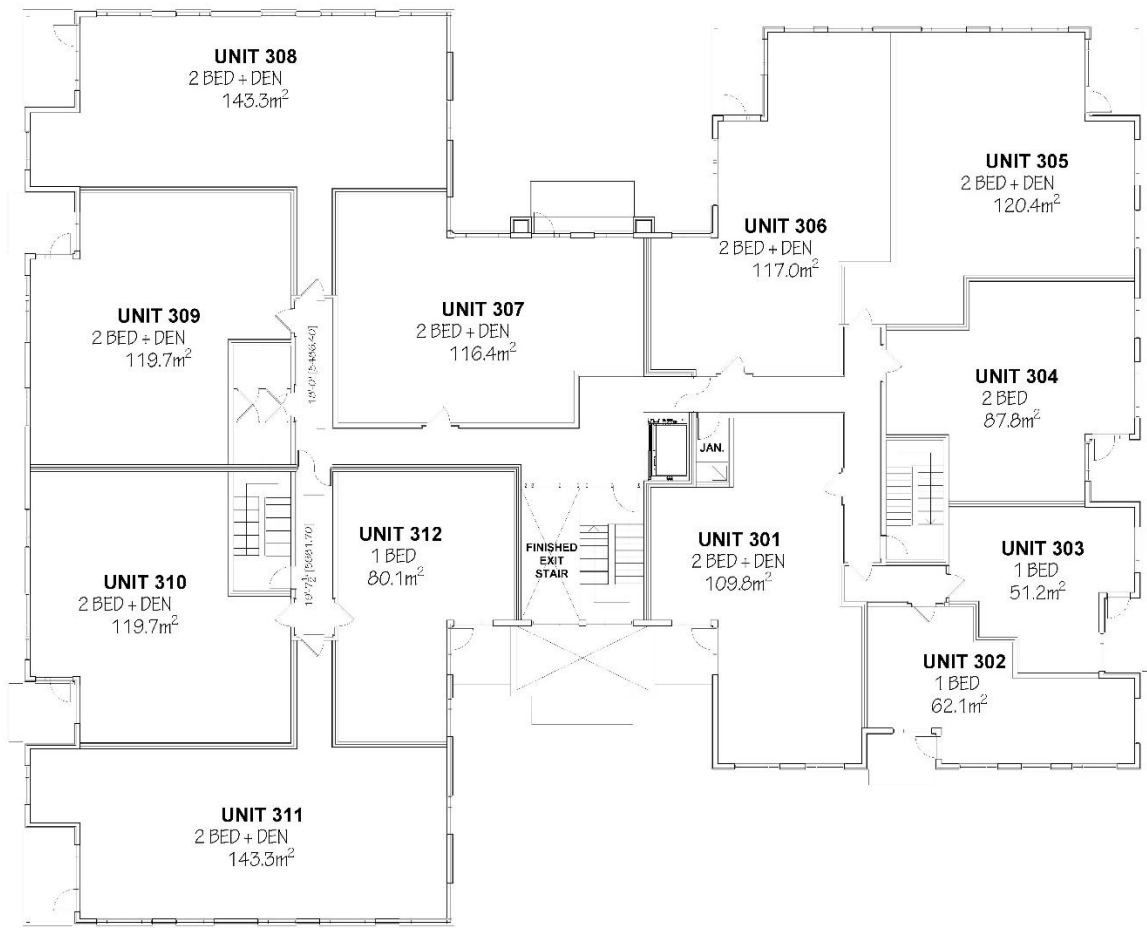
Third Floor Plan (Source: Hobin Architecture).
